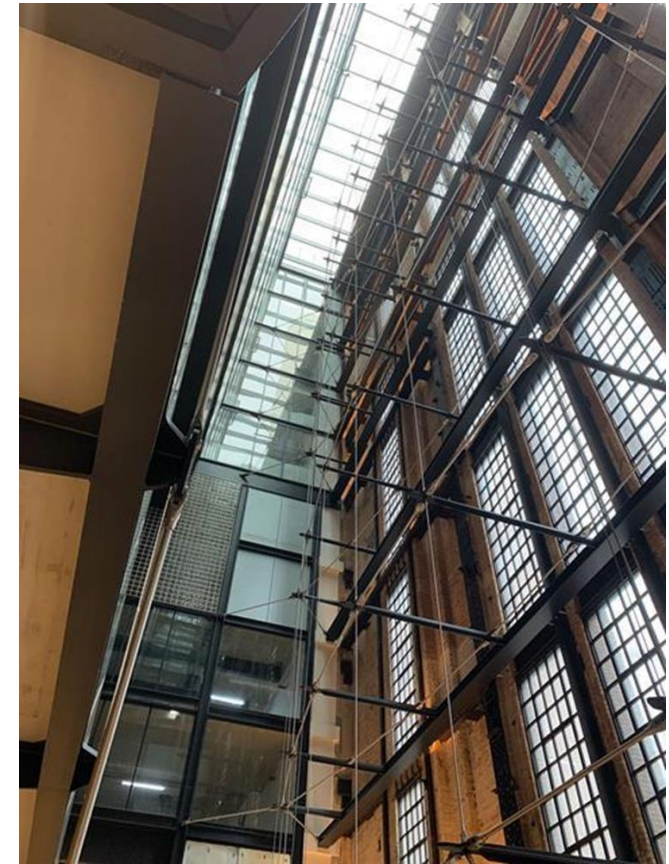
A sophisticated and lighter bowstring truss design made up of compressing columns and tension rods has been used in place of the sturdy temporary structural steel framework that held up the southern wall. (Source: John Sturrock)
